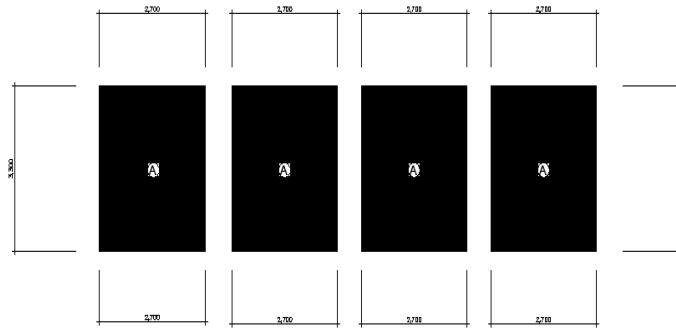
Floor Plan of Mock-Up Arrangement of Prefabricated Korean Style House Mock-up
